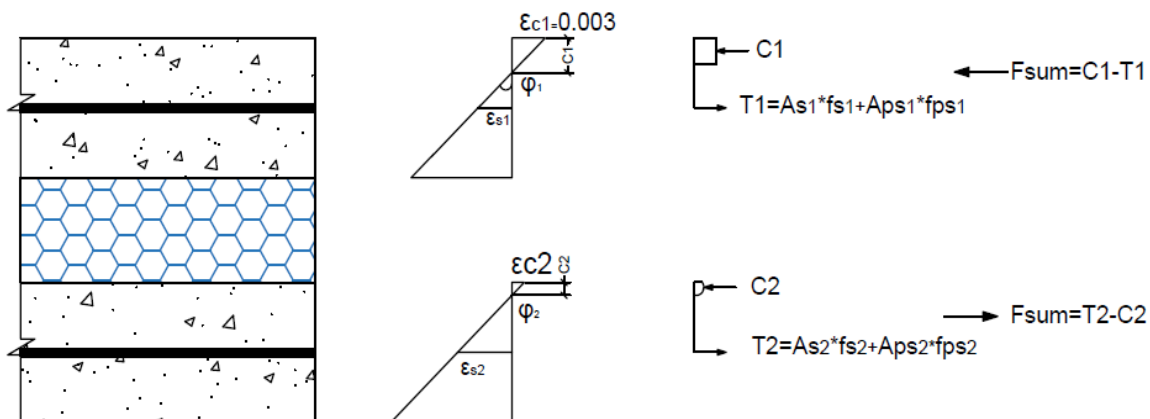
Strain and load profile of concrete sandwich wall panel
